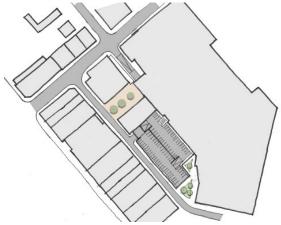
plan of preferred above ground level off street car parking locations in Precinct 6
